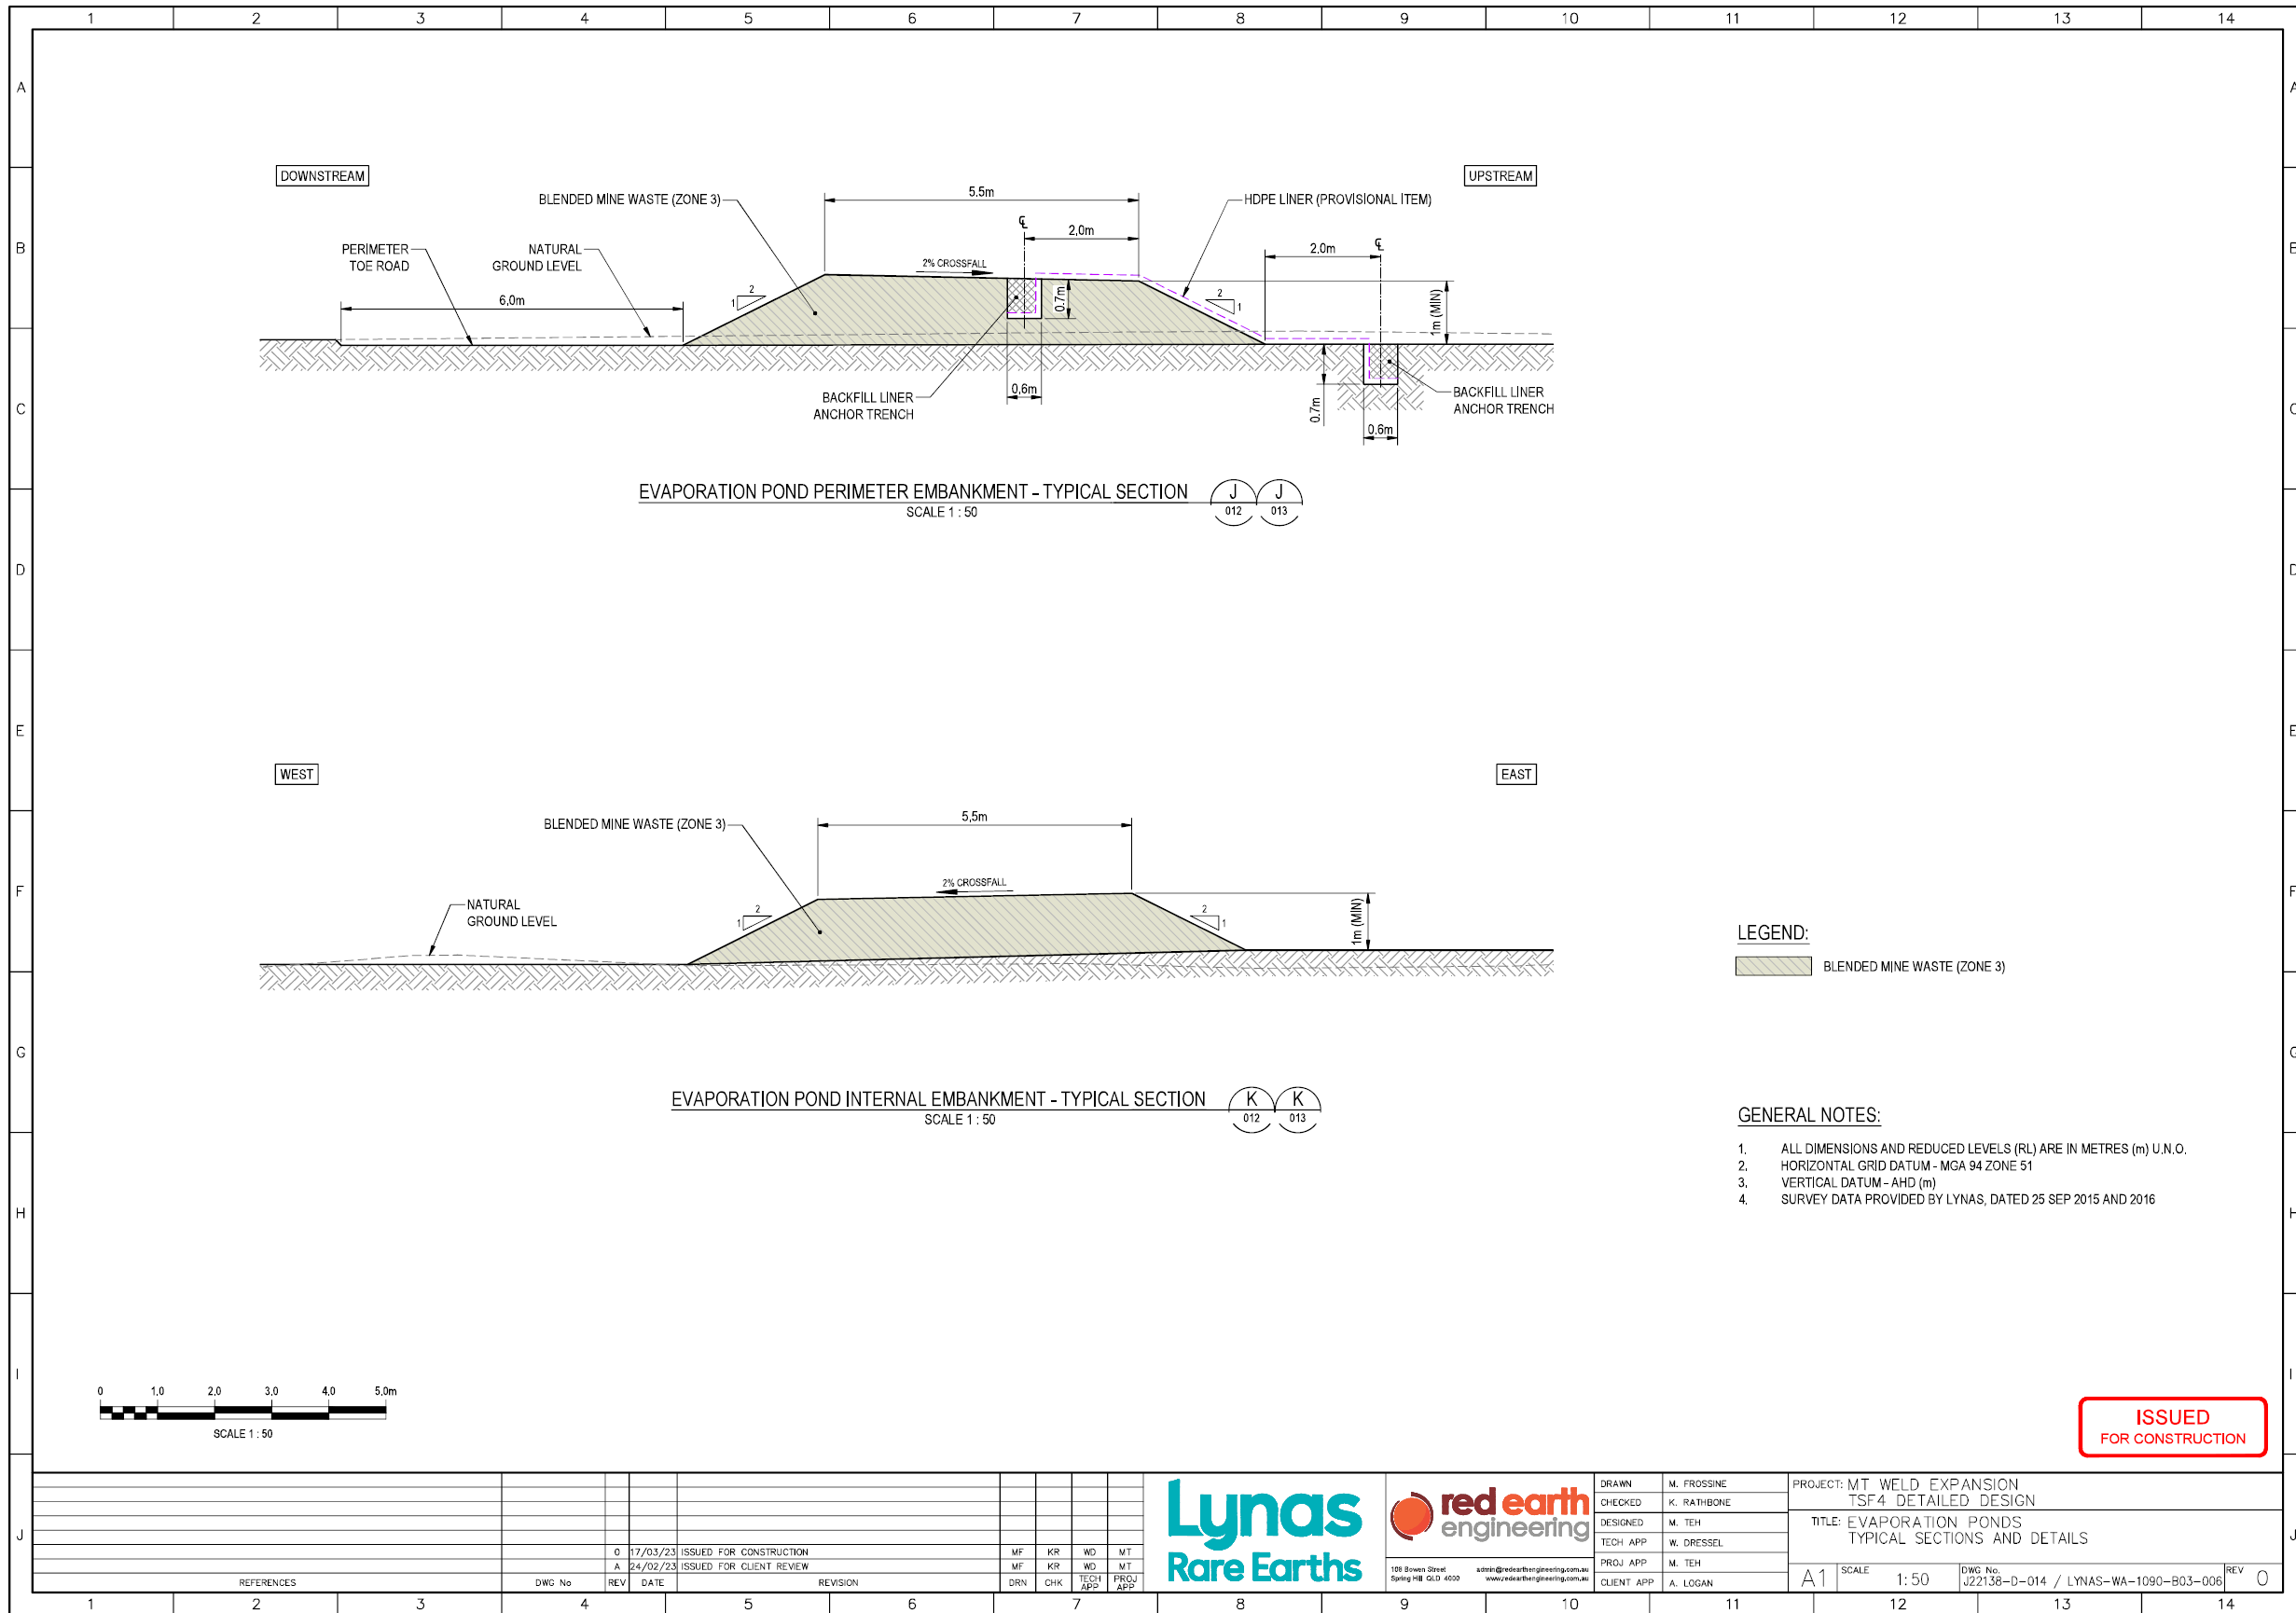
Plan showing design of the internal and perimeter embankments of the Evaporation Ponds.
